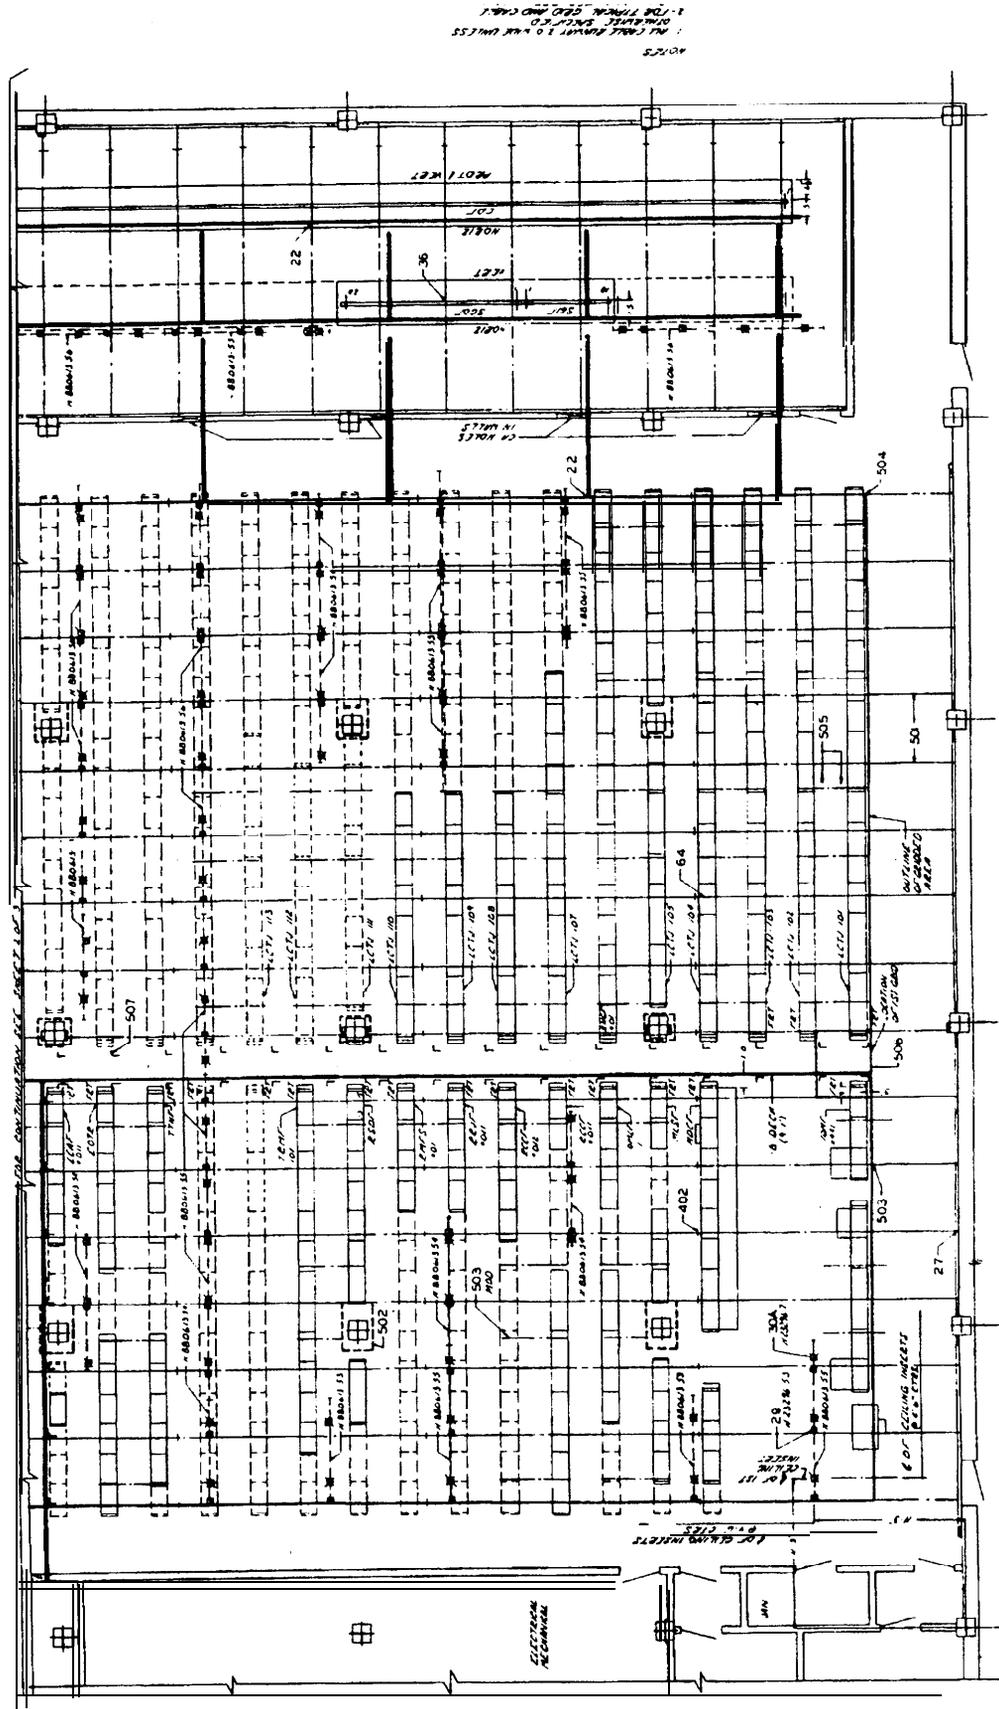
Typical CR Drawing Using Cable Grid - Electronic Office.
